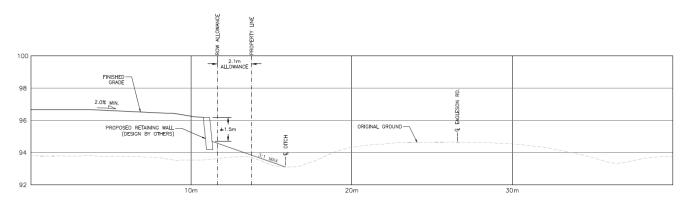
Sample Cross-Section, Eagleson Road Retaining Wall
